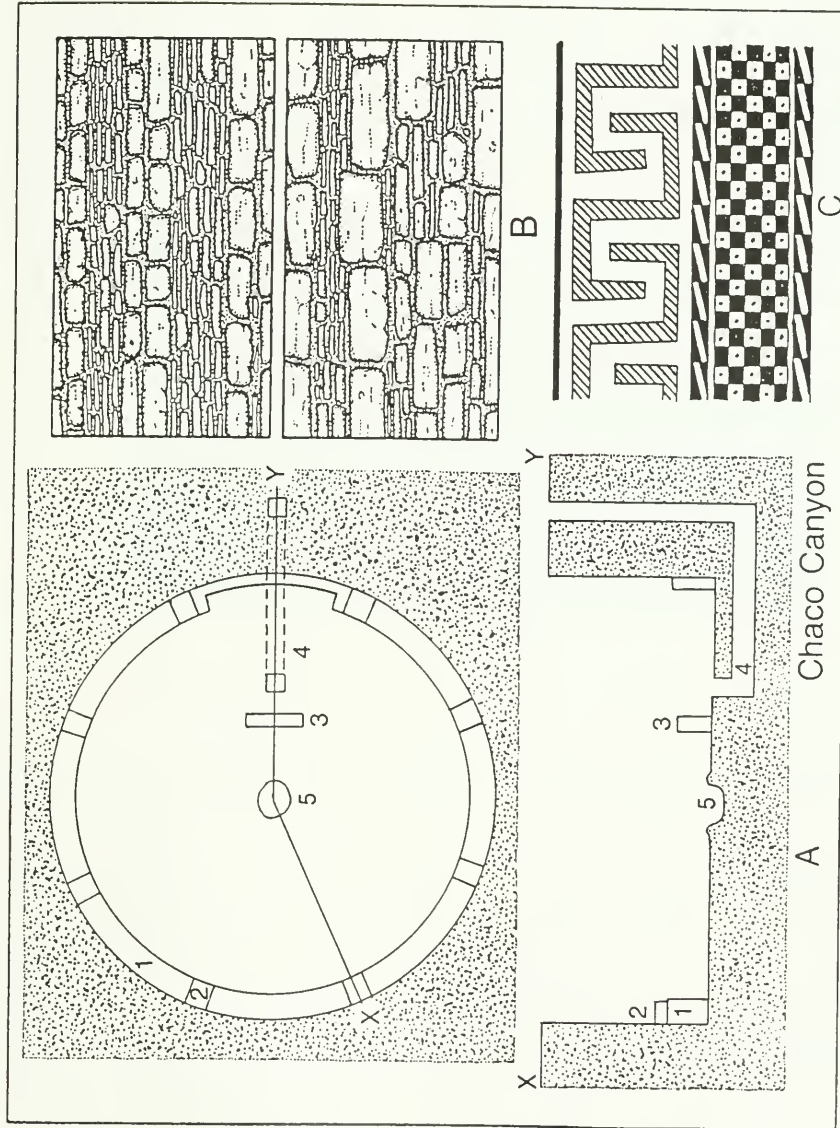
Chaco cultural traits present at Aztec Ruins. A) Plan and profile of typical kiva: 1, bench; 2, low pilaster; 3, deflector; 4, ventilator shaft; and 5, firepit. B) masonry types. C) pottery designs. (After Lister and Lister, 1987: 89).
